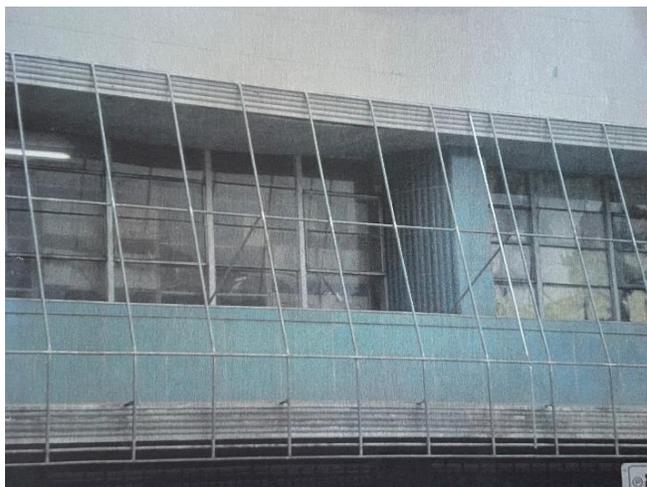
Photograph of primary façade of 2530 Bancroft taken July 2007 showing extant façade details beneath awning. Collection of BAHA.
